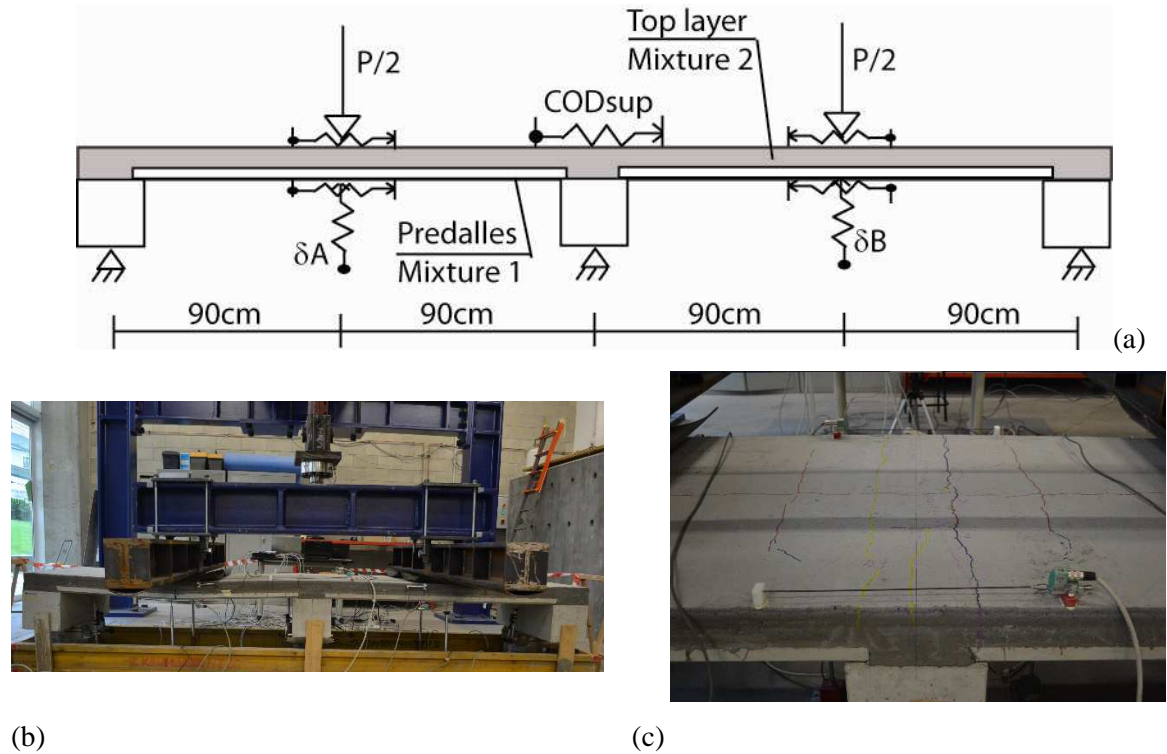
Test on composite solution: (a) loading scheme (b) specimen and failure and (c) crack pattern over the central support
